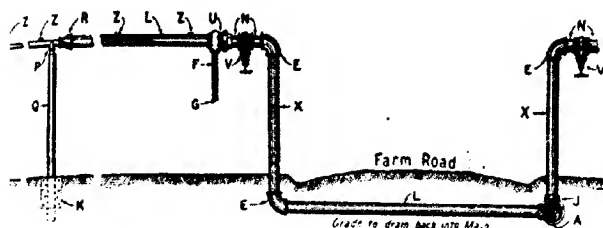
Typical fittings for overhead nozzle lines connected to main feed pipe and method of crossing a farm road.
